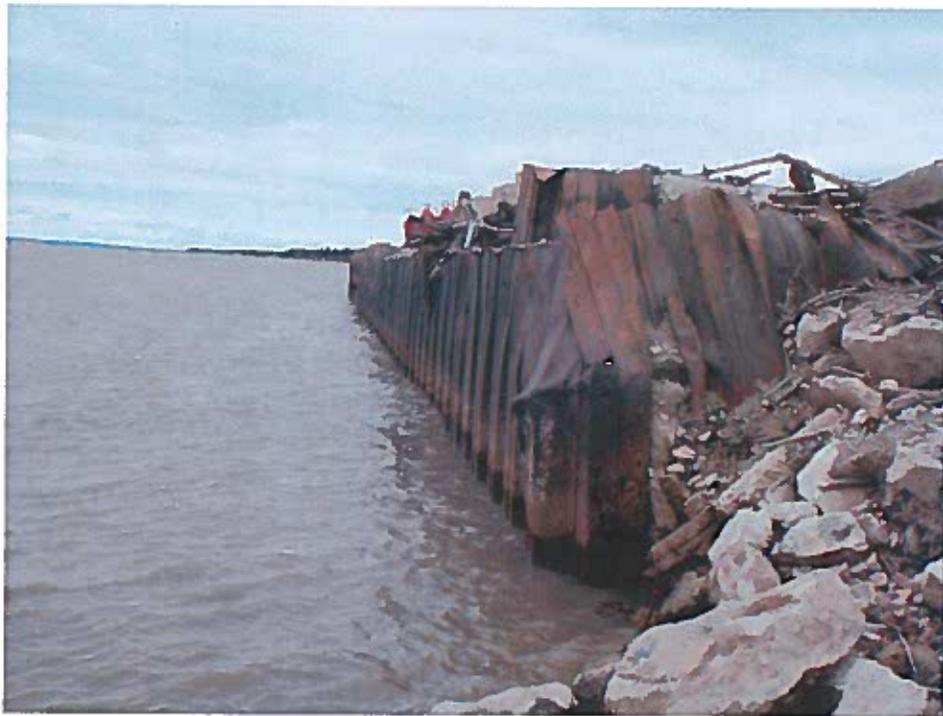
Extensive damage on Southeast corner of the wharf. East wall buried in debris
